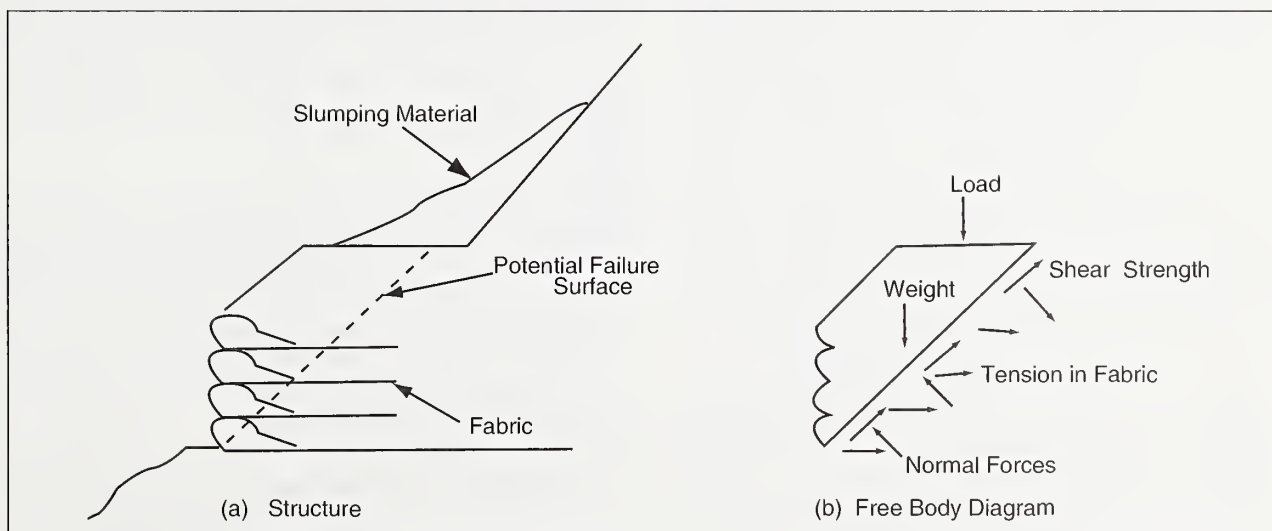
Geotextile-reinforced soil retaining structure. (Bell, 1990)
